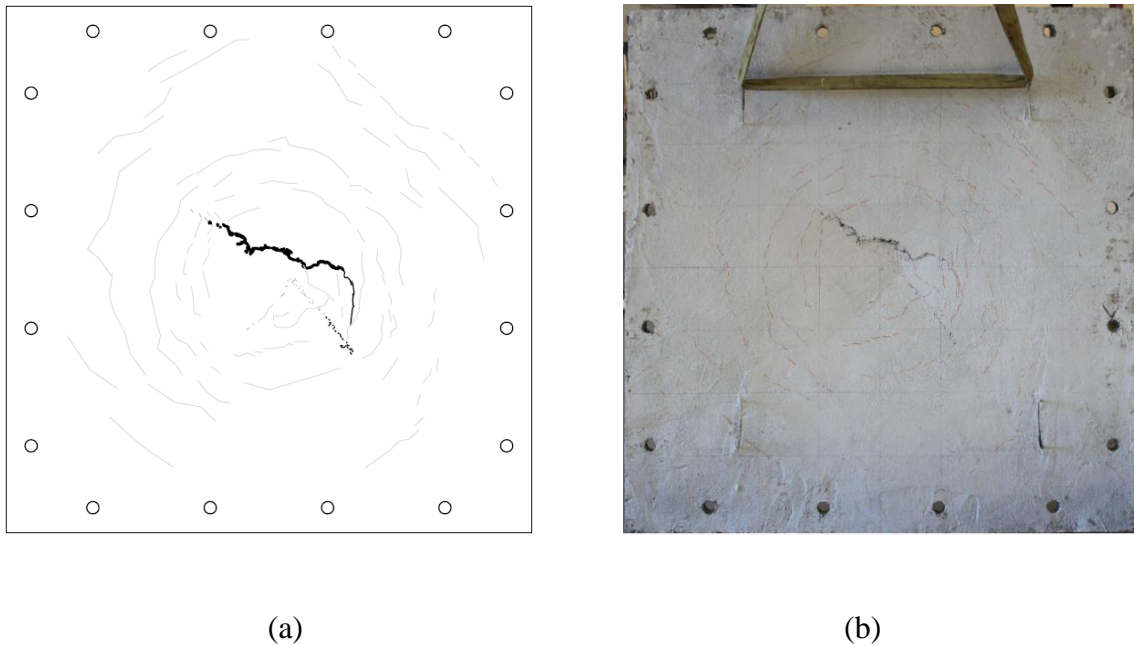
Top surface crack patterns after testing for panel JN3-075+PVA
